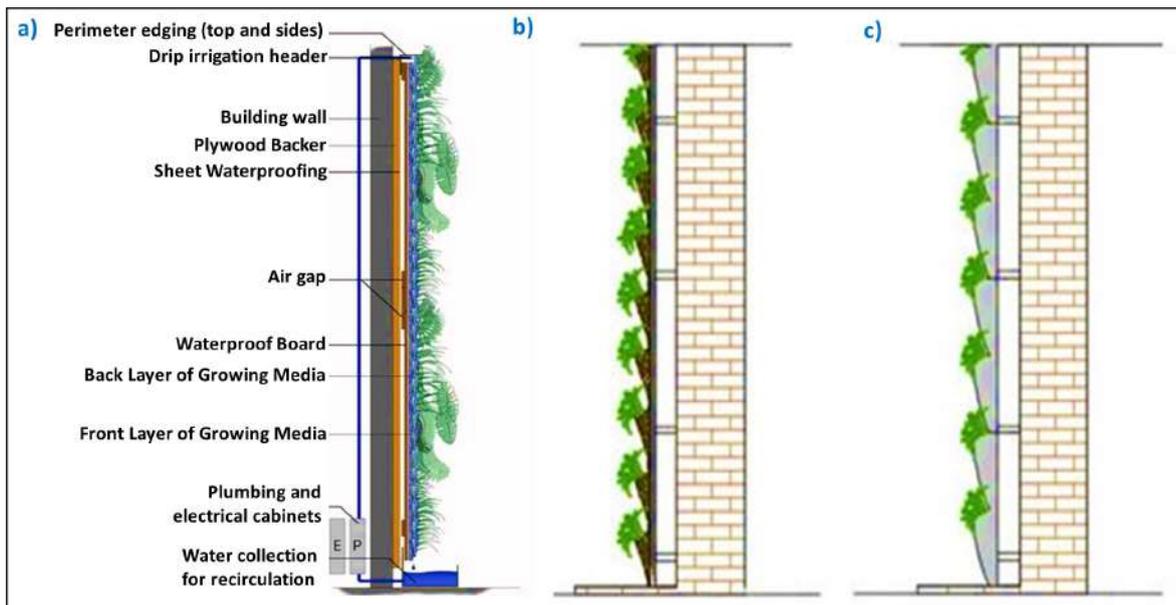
Living walls structure and type a) Schematic representation of a living wall b) continuous living wall c) modular living wall
